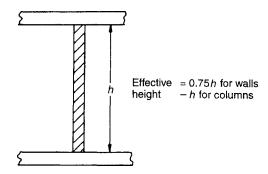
Effective height for wall/floor and wall/column arrangement.
